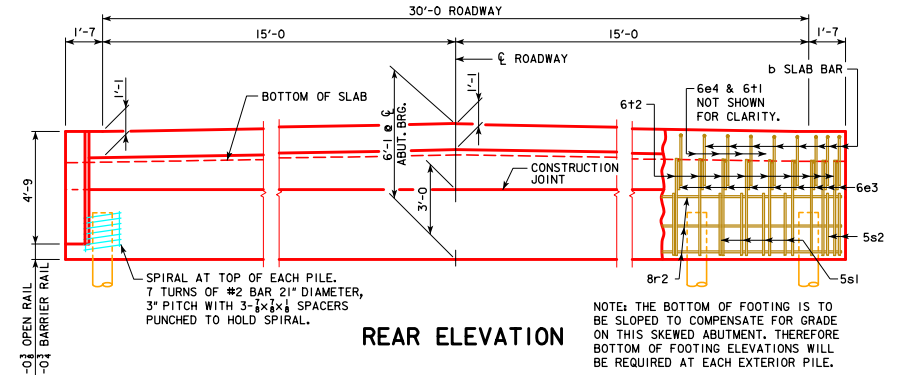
DETAILS ON THIS SHEET ARE TO BE USED ONLY WHEN ABUTMENTS ARE PLACED ON TIMBER PILES.
